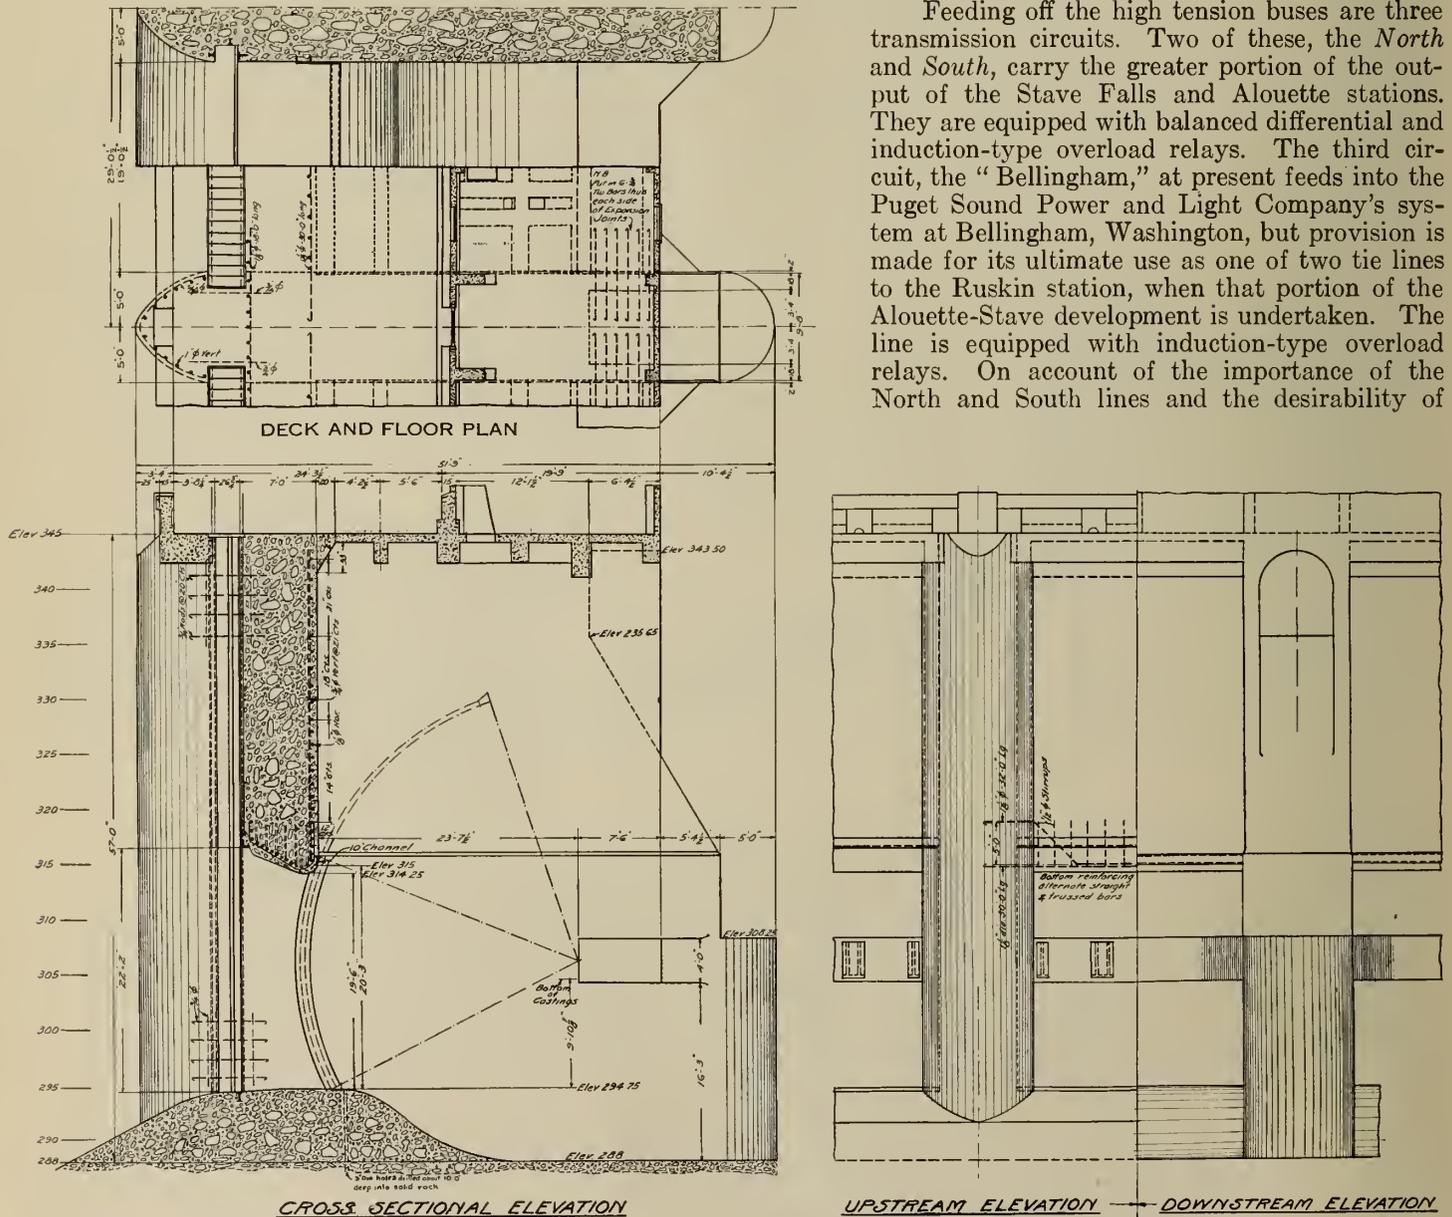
Stave Falls Power Development—Typical Plan and Elevations of Tainter Gate Section of Blind Slough Dam.
